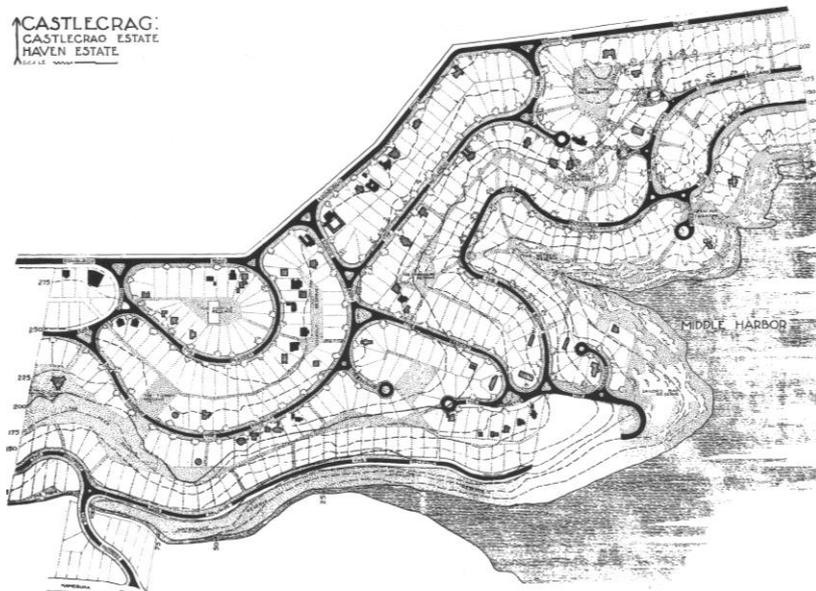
Plan of Castlecrag and Haven Estates, 1932, showing the contours and landscape elements of the area, including houses constructed in black, and houses planned but not built hatched. Source: Walker, M. et al; *Building for Nature: Walter Burley Griffin and Castlecrag*, Walter Burley Griffin Society Inc., 1994
